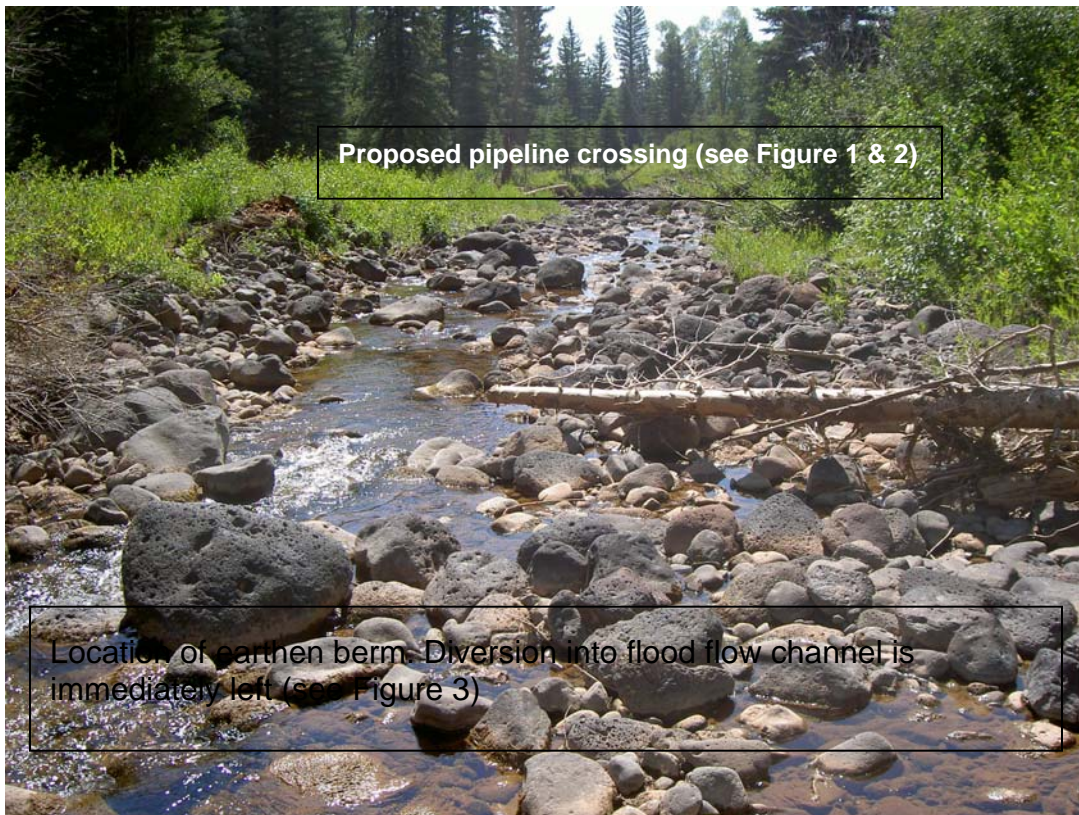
Location of earthen berm to temporarily divert West Muddy Creek into flood flow channel during construction (looking downstream, southeast).
